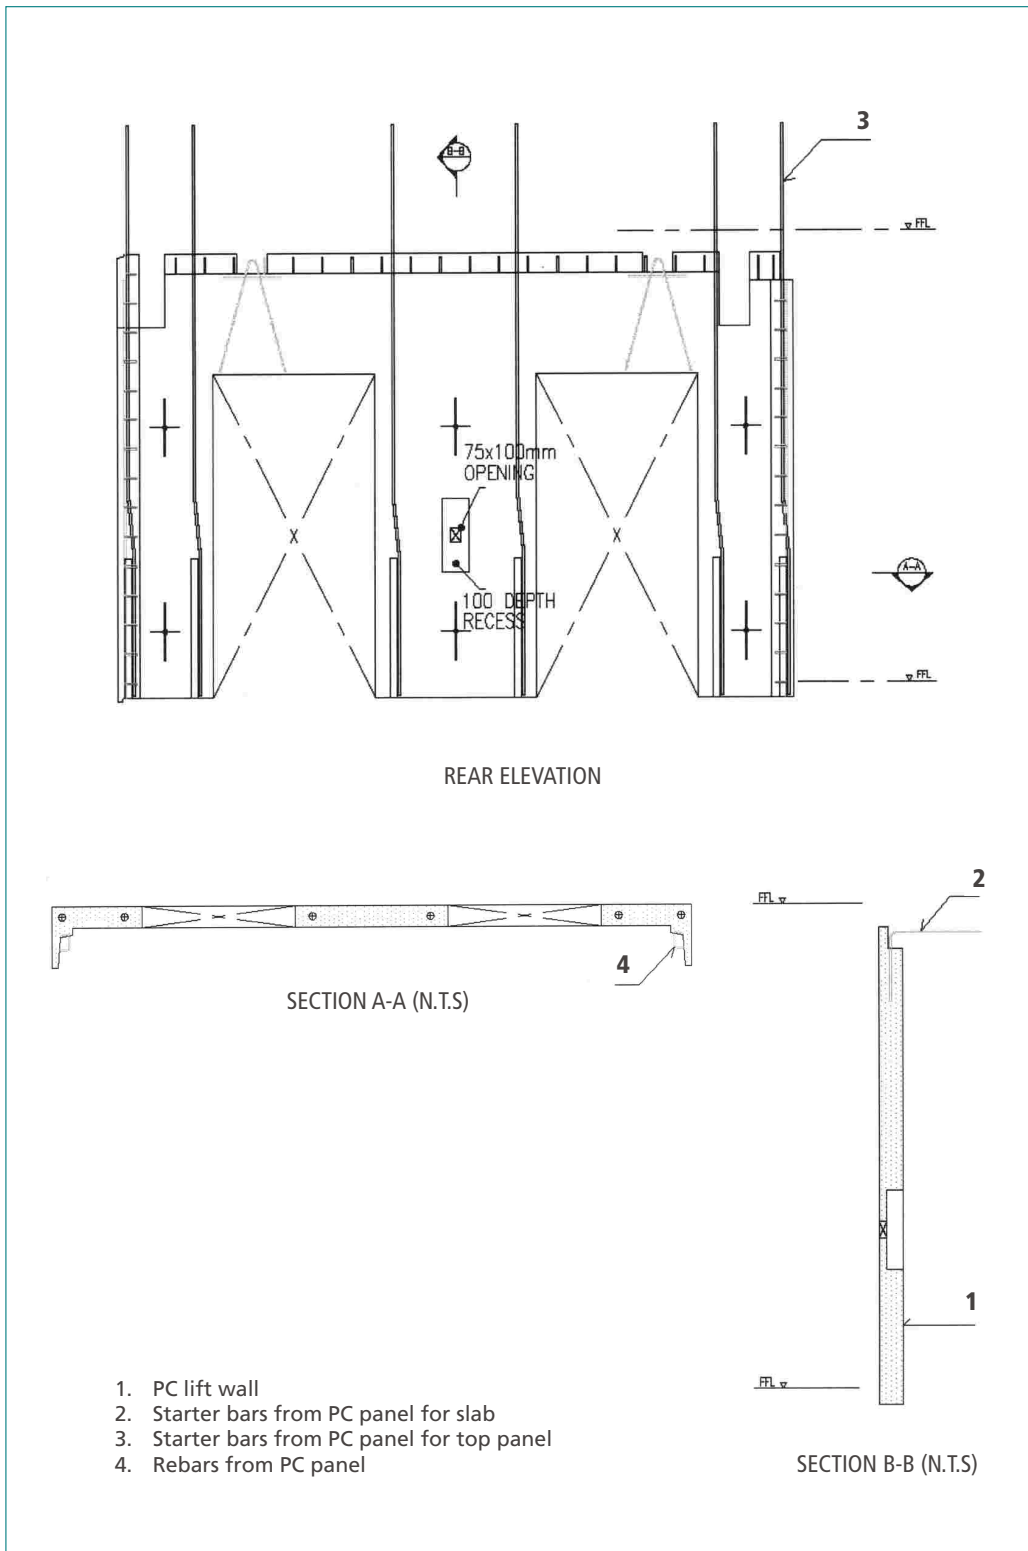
Example of PC lift wall details and connection with floor elements
